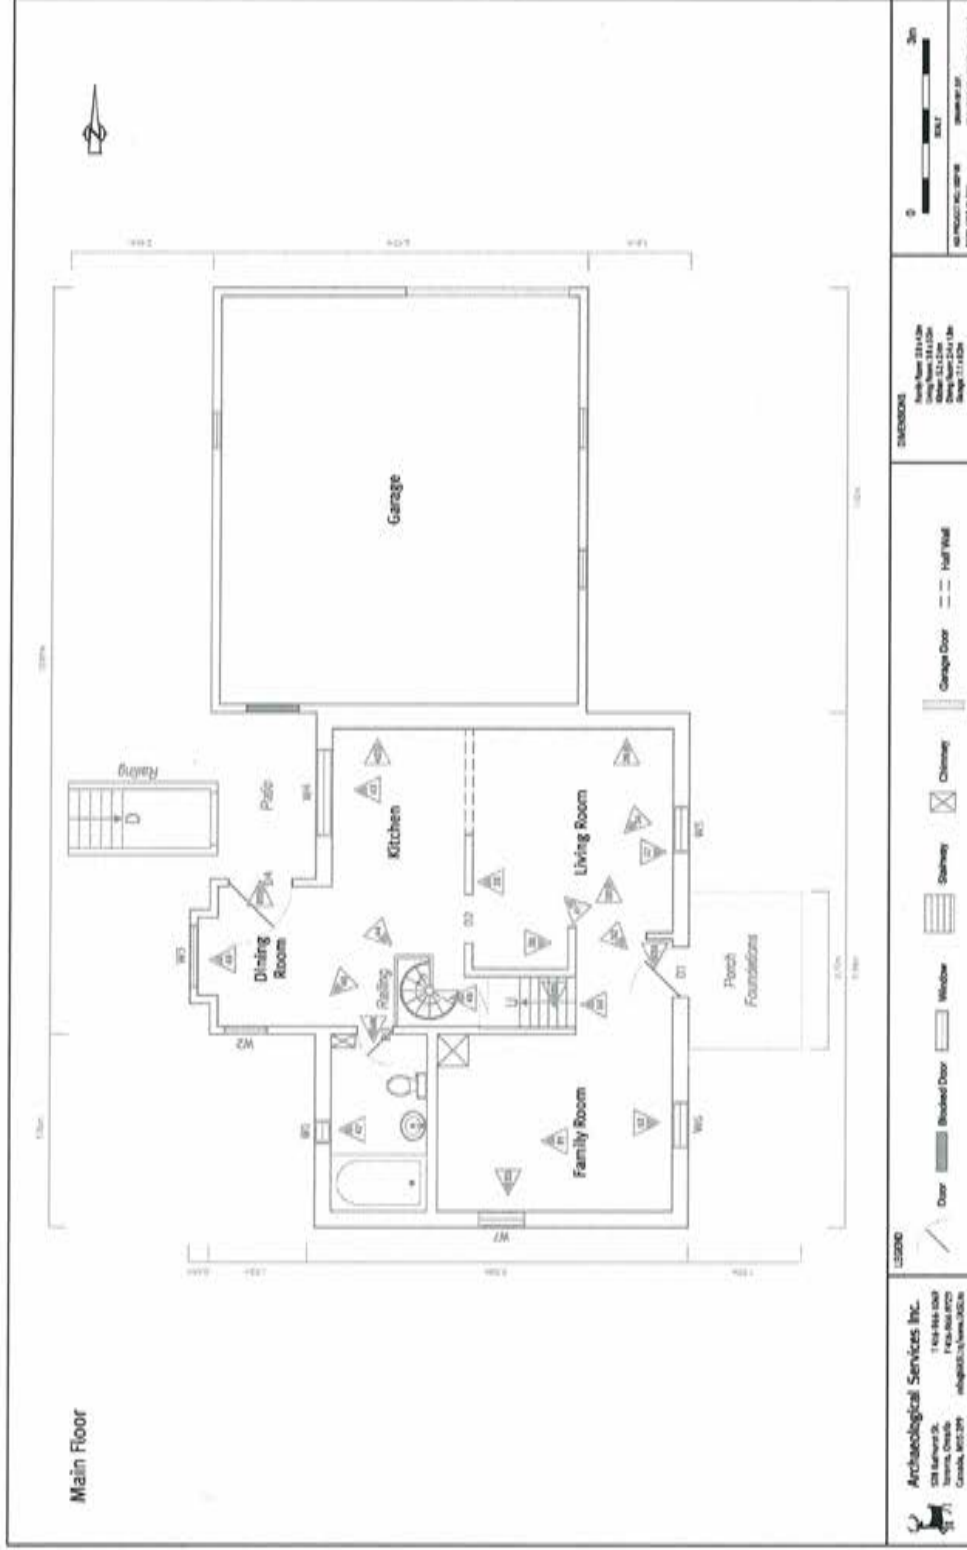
Interior floor plan showing overall dimensional measurements of residential exterior and internal rooms.
